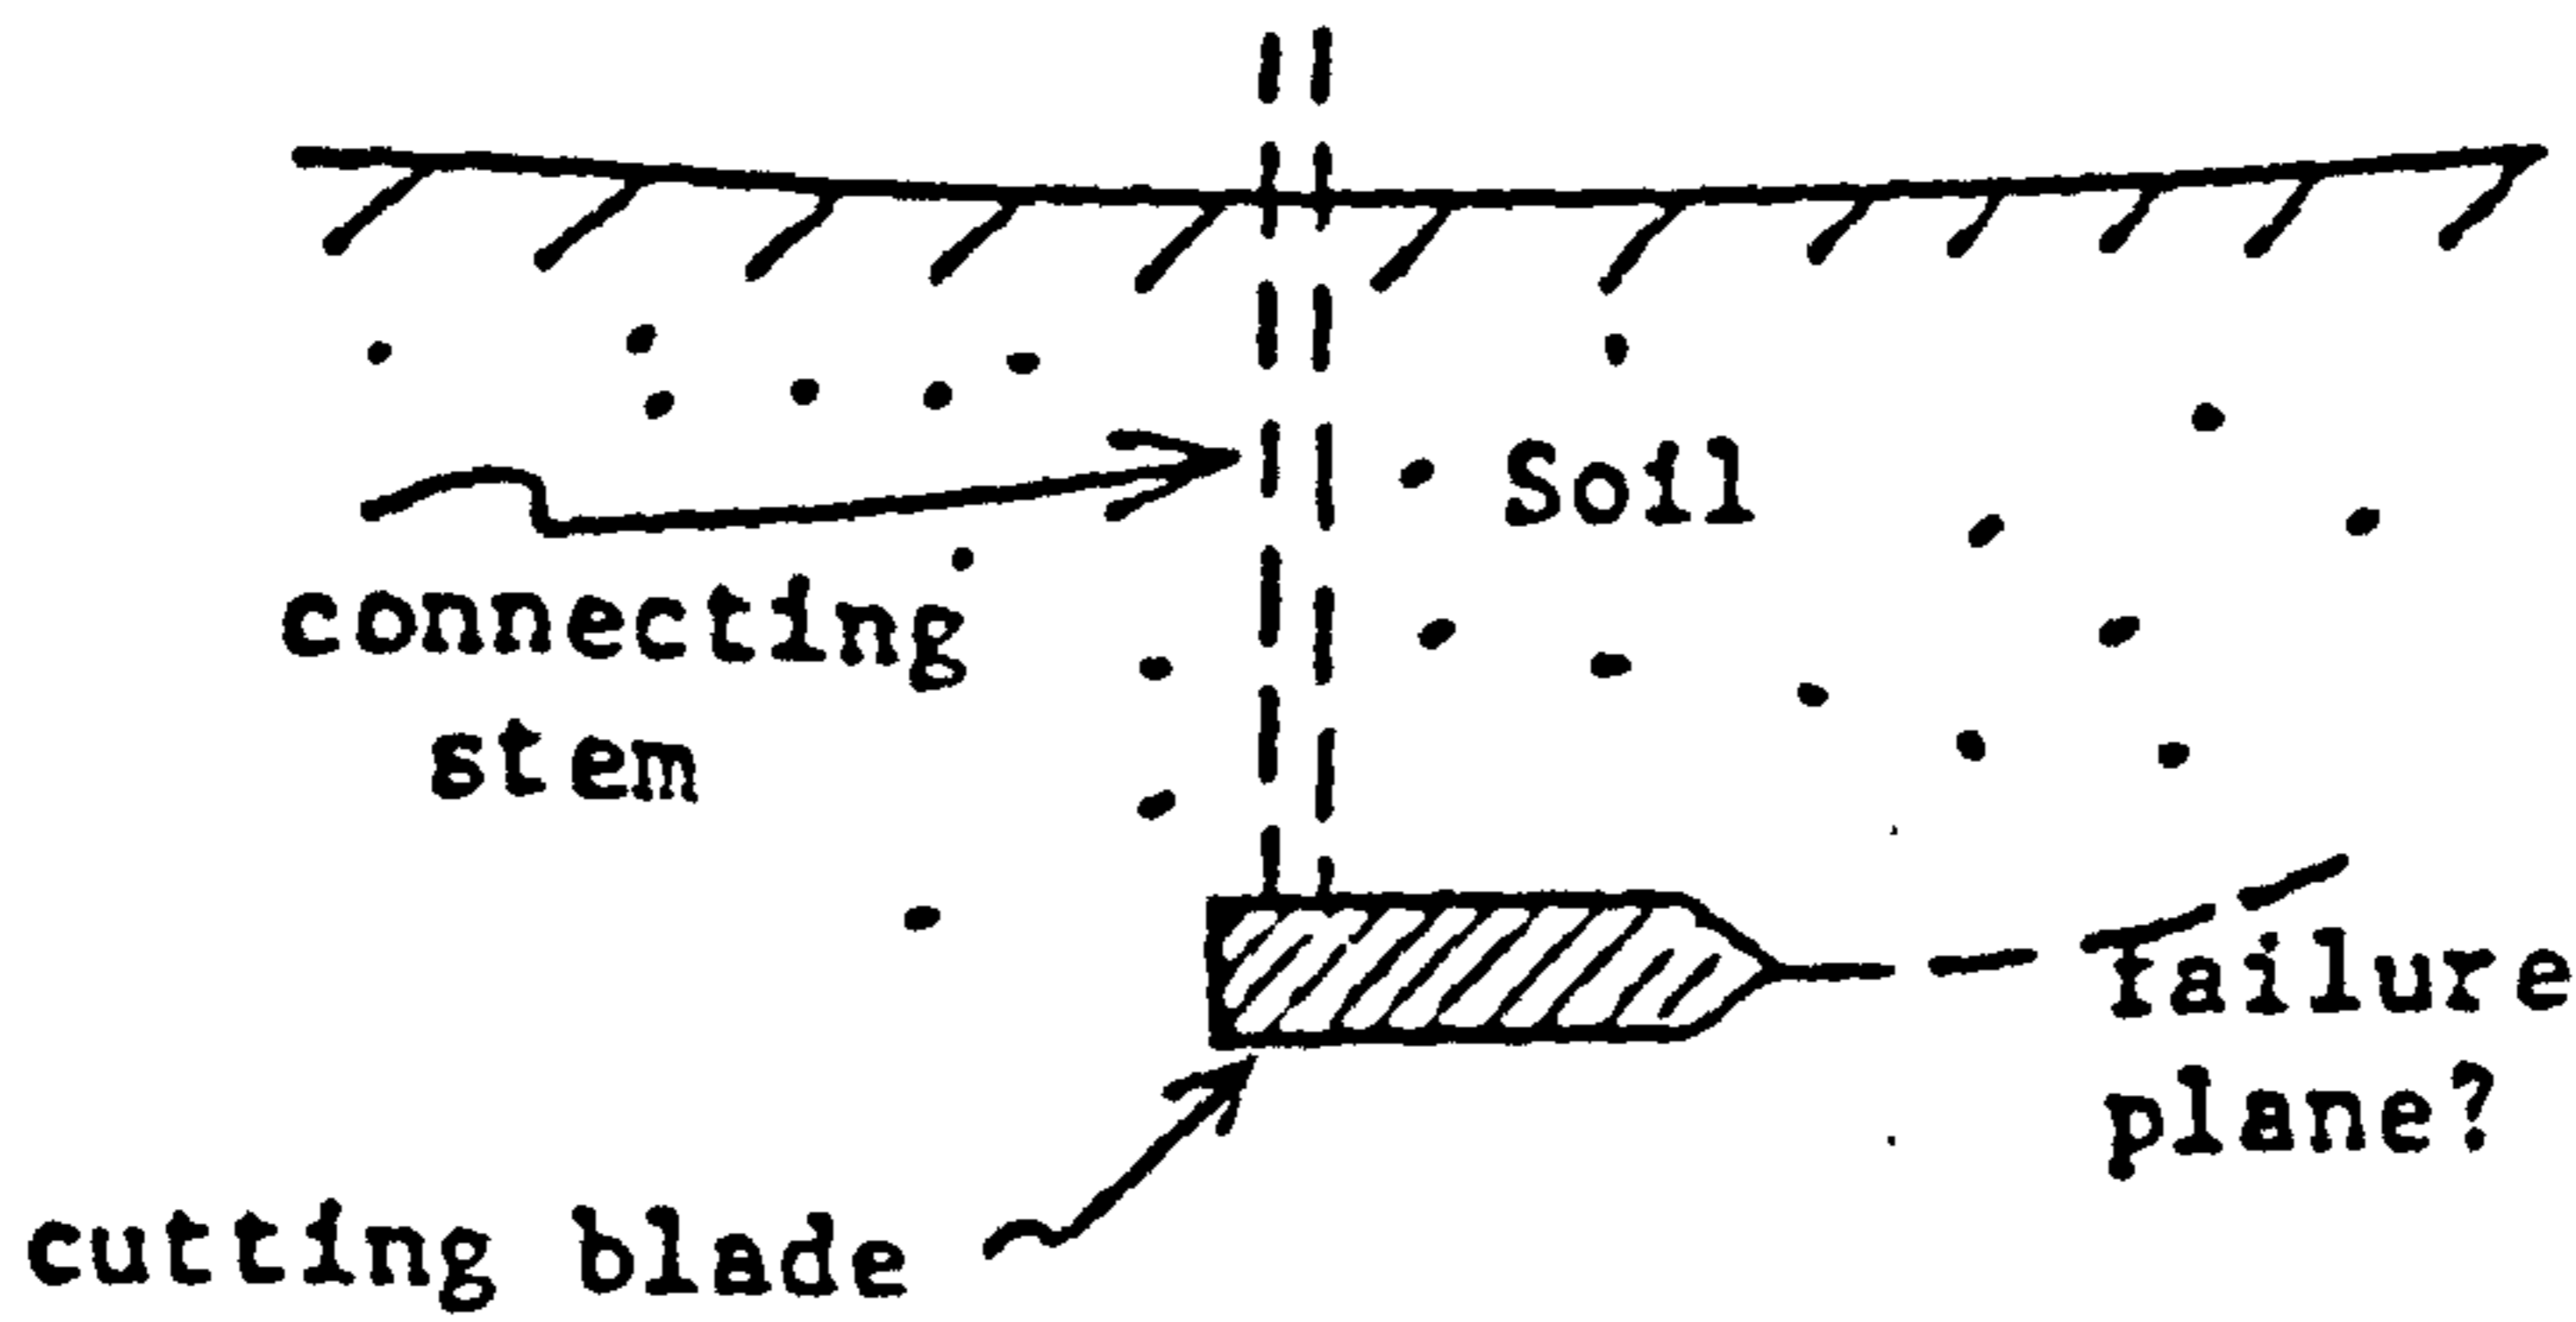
Sketch showing cutting tool geometry in relation to the soil.
